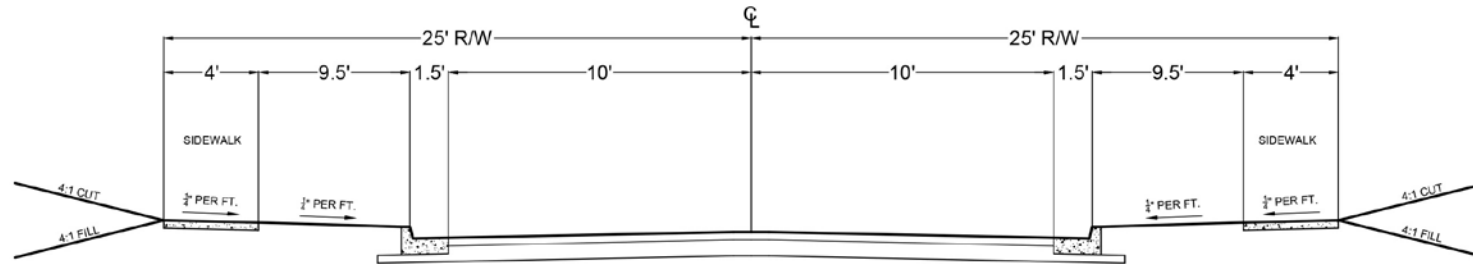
Typical Section for Residential Local, Cul de Sac over 500 Feet Long, Commercial Service Road; Residential Cul de Sac Under 500 Feet Long
